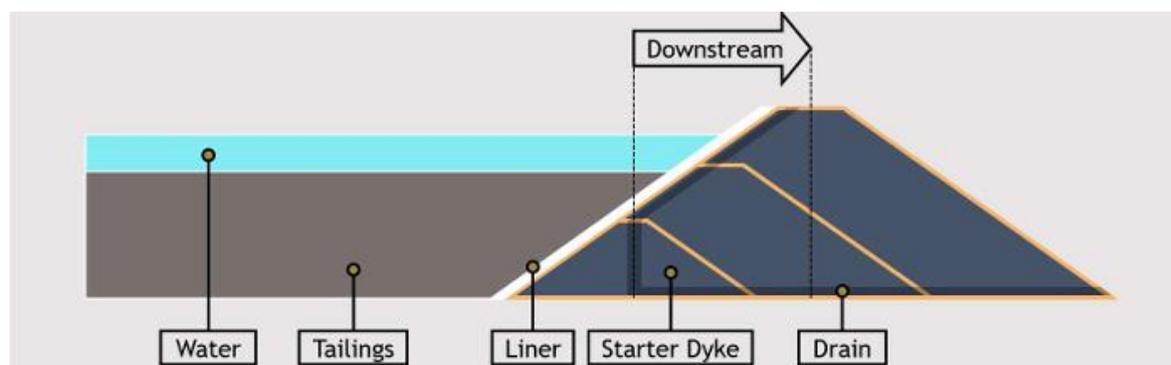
Downstream Tailing Storage Facility design (Yanama Gold, 2023)
